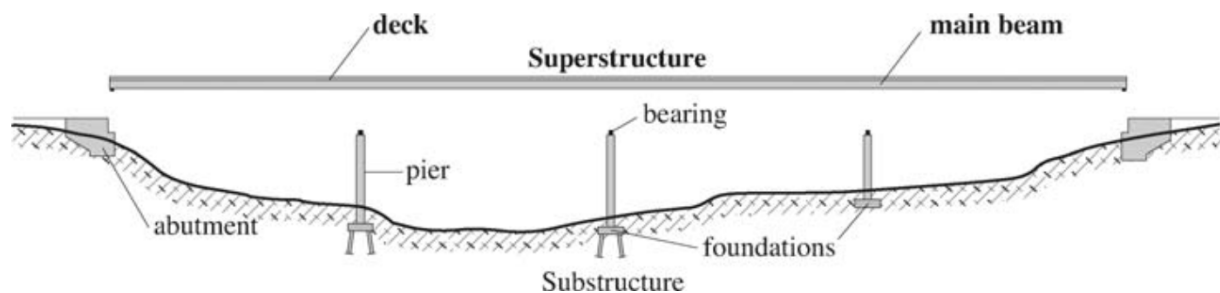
Super and substructure of a bridge (Pavlovic & Kolstein, 2016)
